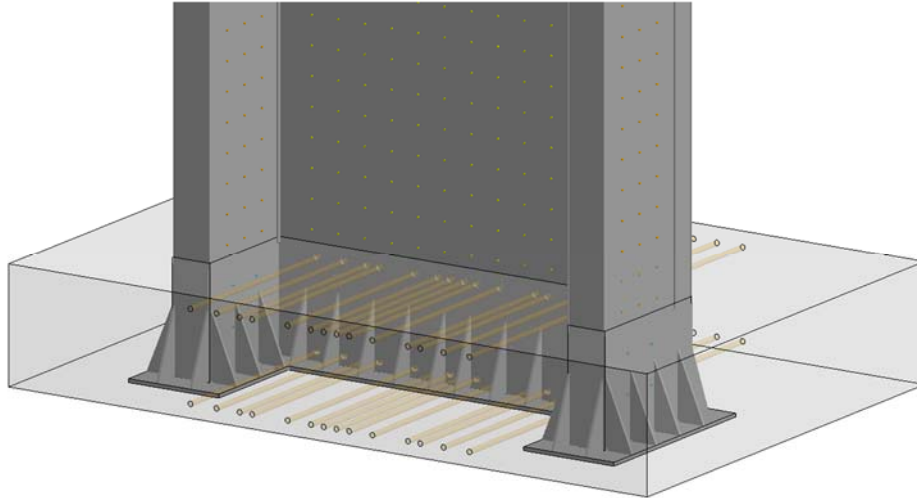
Composite wall-to-basemat connections with welded base plate and rebar couplers (concrete only shown partially to highlight rebars and couplers) (Bhardwaj and Varma, 2016)
